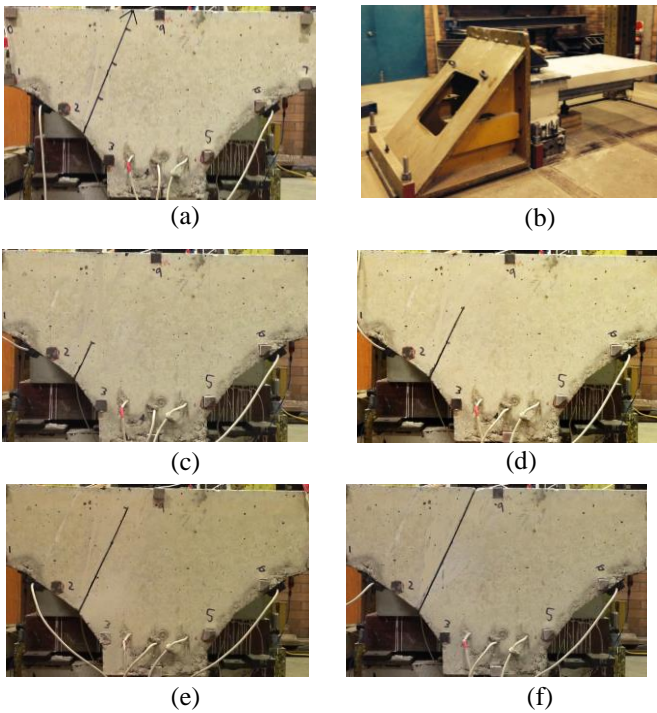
Boundary condition and loading of the beam specimen: (a) intact with the arrow indicating the direction of the cut, (b) clamping of the specimen, (c) 75 mm cut, (d) 150 mm cut, (e) 225 mm cut and (f) 270 mm cut.
